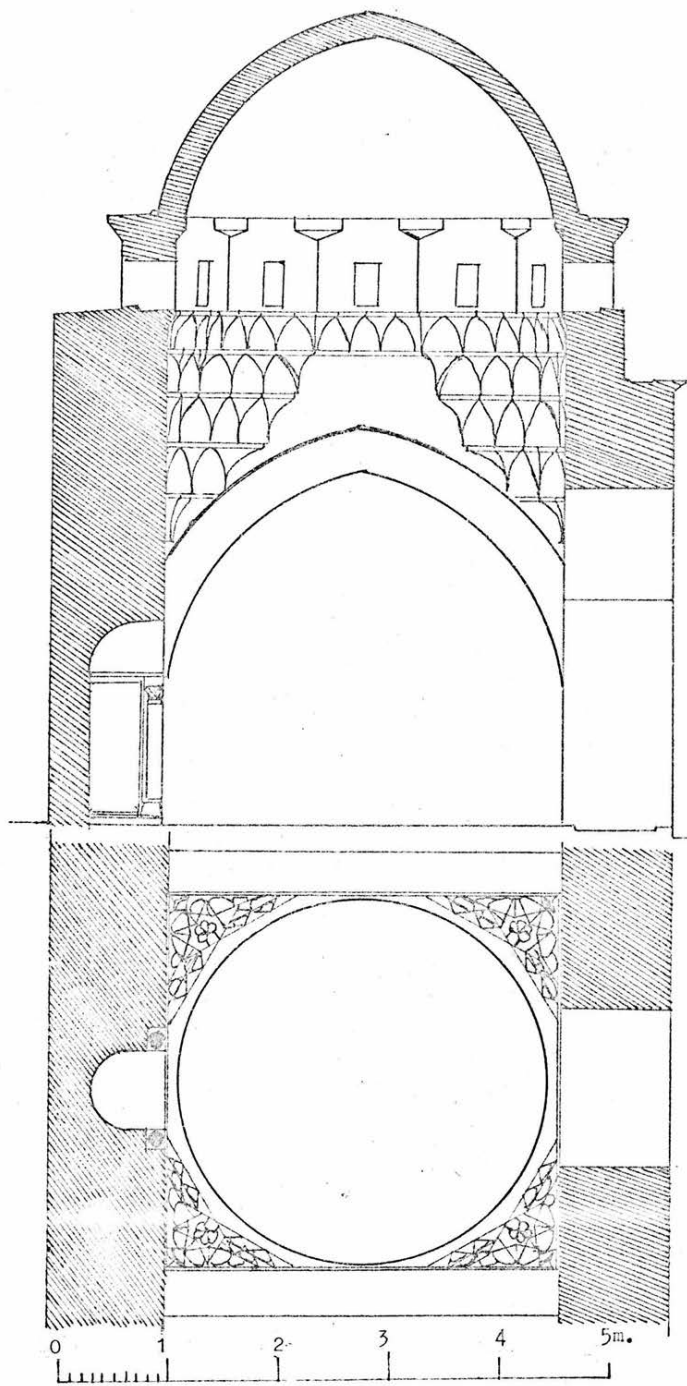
, AL-FIRDŪS, Plan & Section;The Central Dome of The Prayer Hall.
